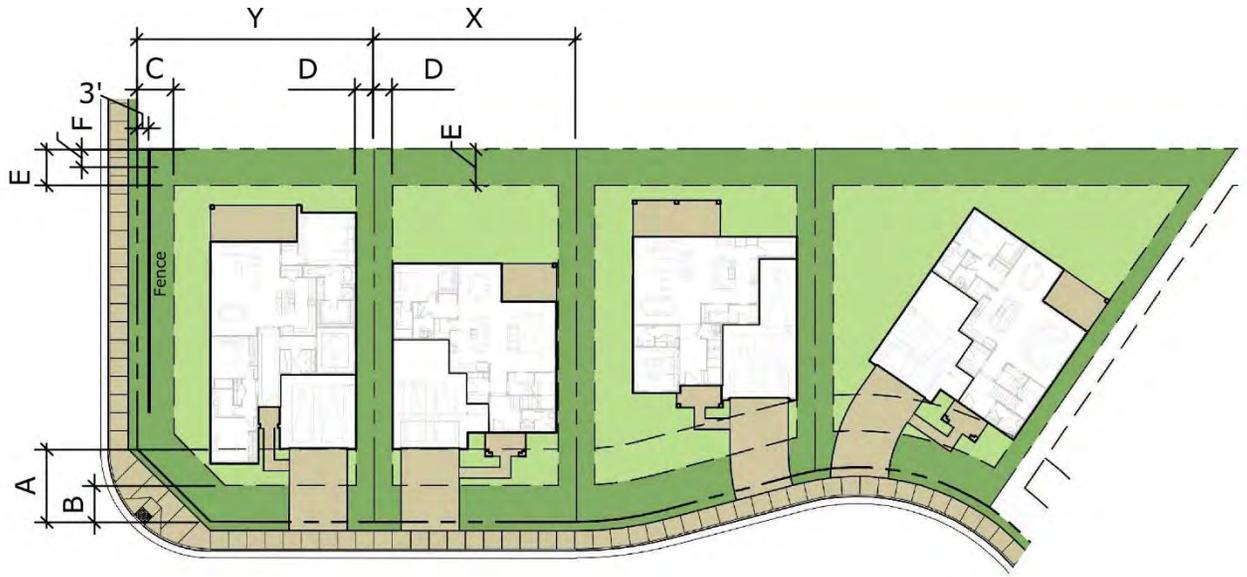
Lot Configuration and Setbacks Plan
